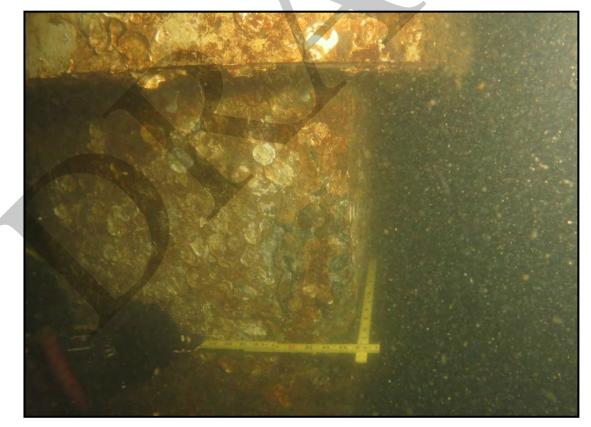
Deterioration of original concrete pile exposed below encasement repair.
